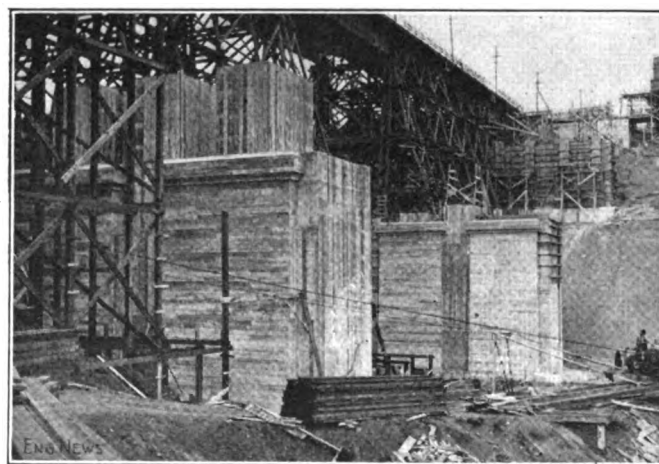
VIEW OF PIERS DURING CONSTRUCTION
